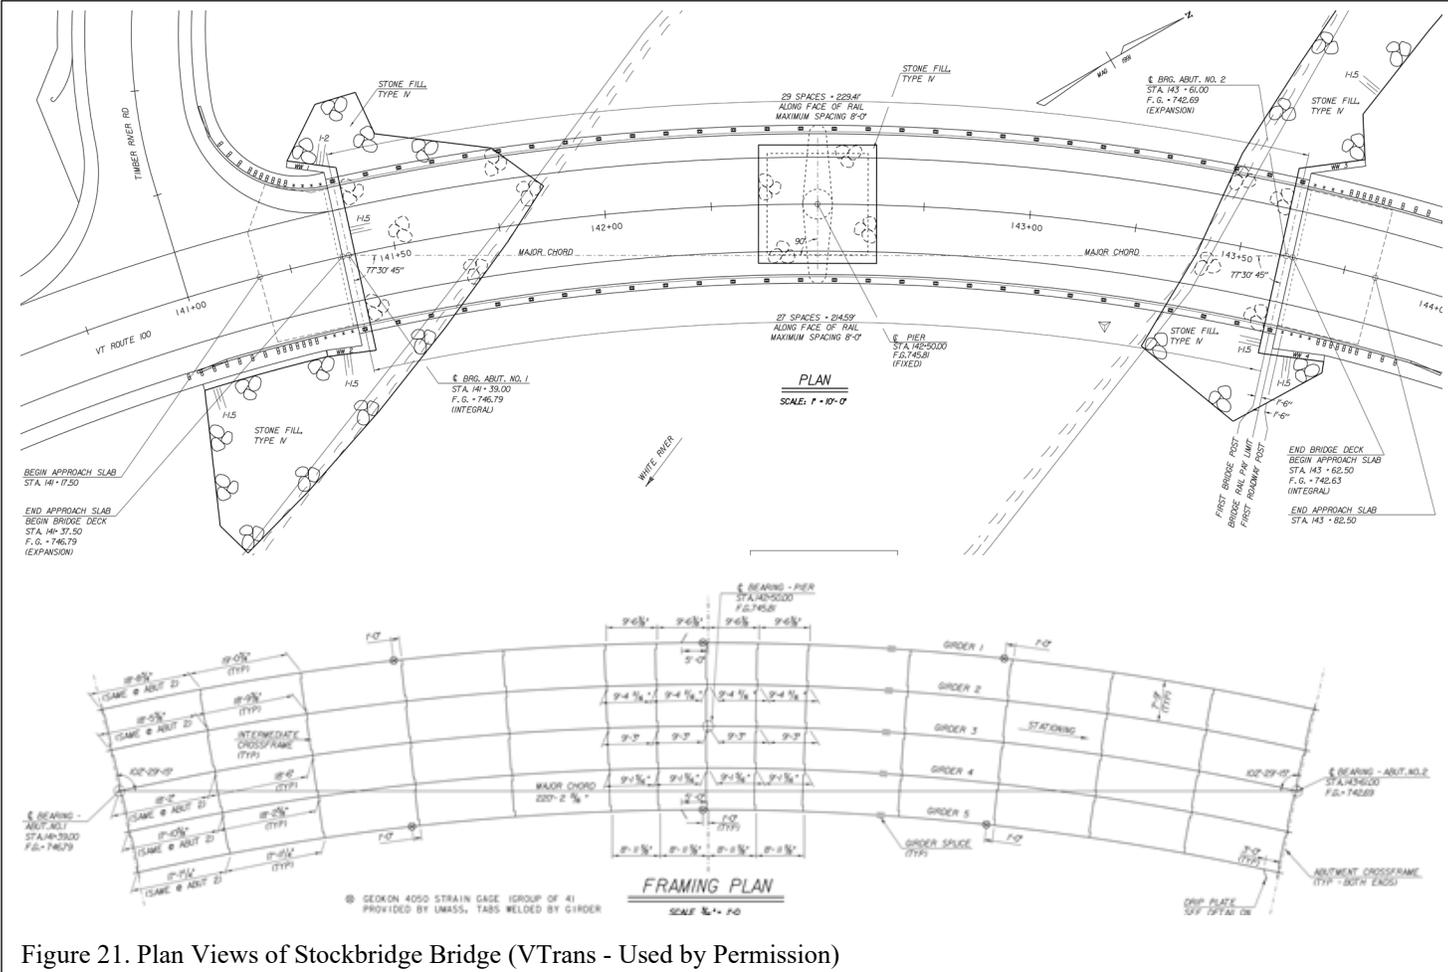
Plan Views of Stockbridge Bridge (VTrans - Used by Permission)
